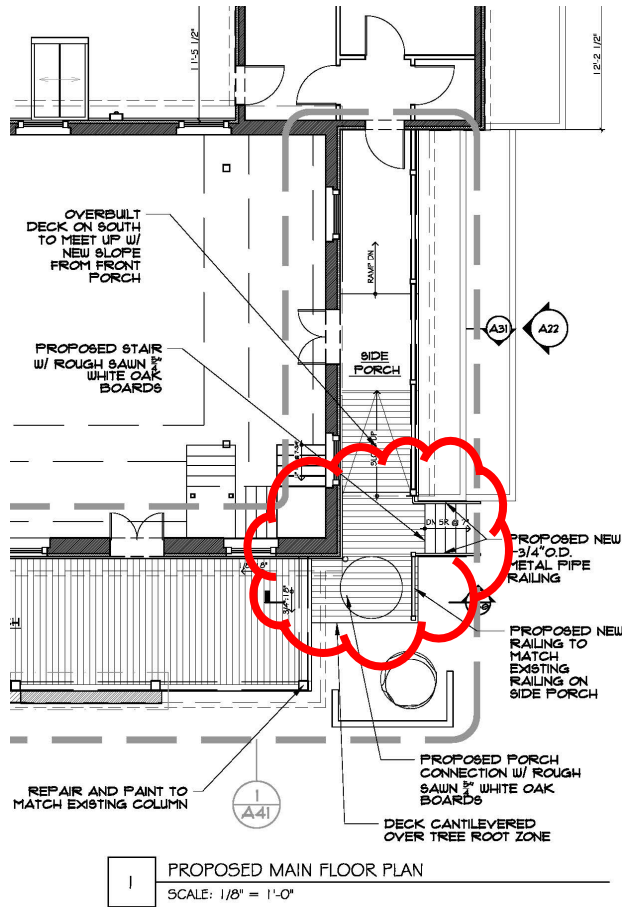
The proposed connecting deck and new stair and railing are clouded in red.
